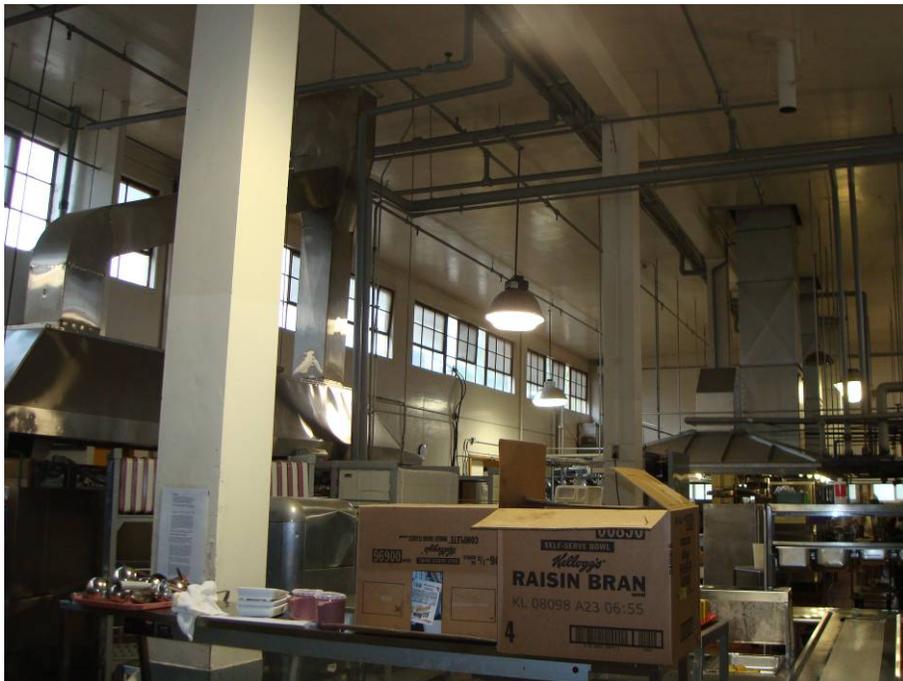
View of Outdated Fire Sprinkler System of Building 16.
